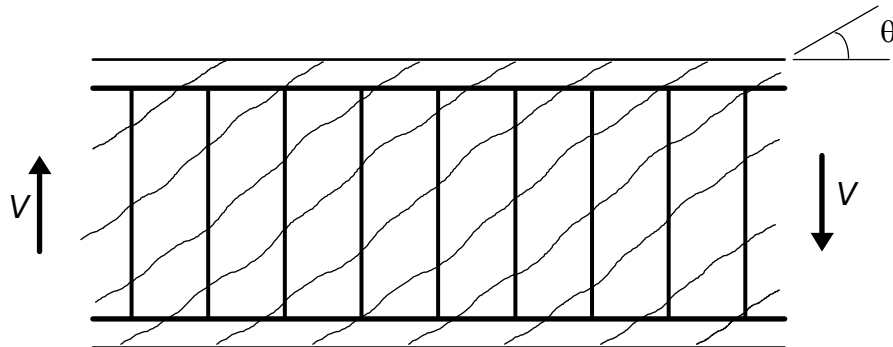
Crack Inclination of Element Subjected to Shear (adapted from 5-1)
